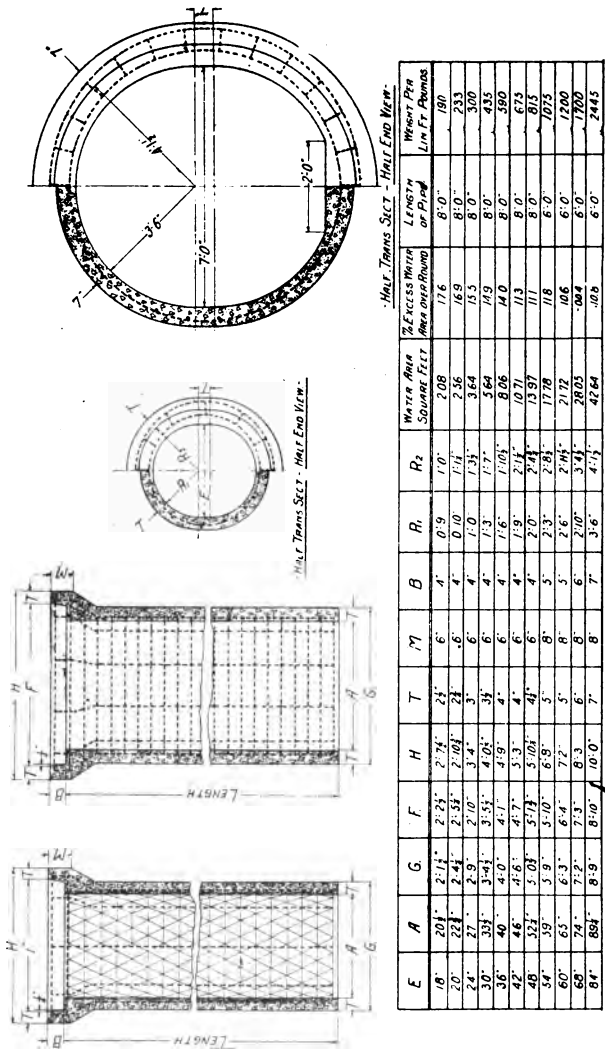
Standard Sizes of Reinforced-Concrete Railway Culvert Pipe
